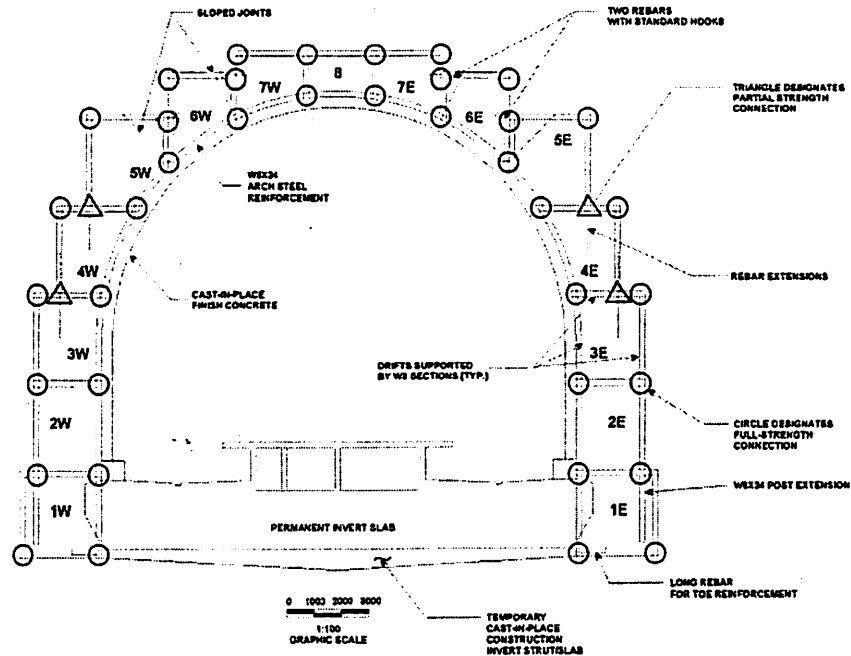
Structural Requirements for Stacked Drift Tunnel Reinforcement
